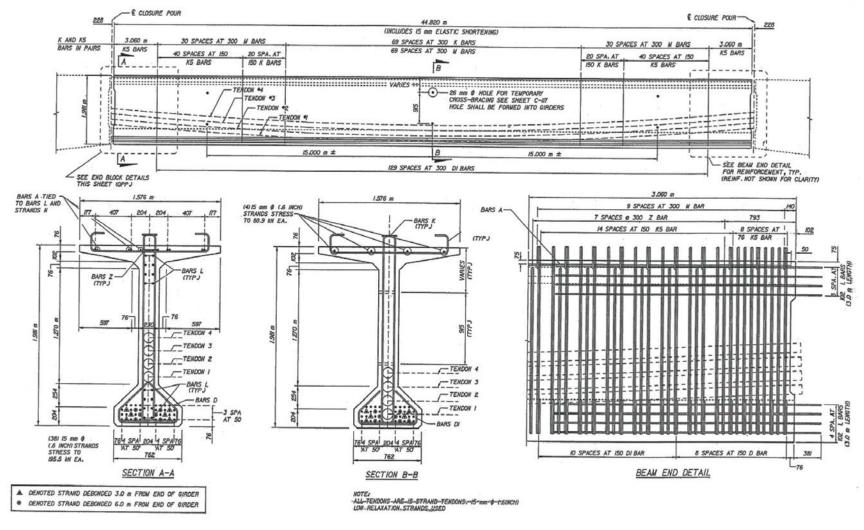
Illustration. Modified Florida bulb-T78 beam drop-in segment.
